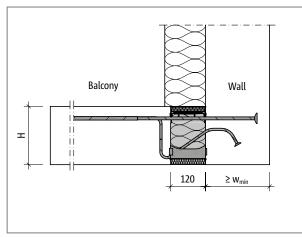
Schöck Isokorb® XT type K-U: Wall connection upwards with external insulation
